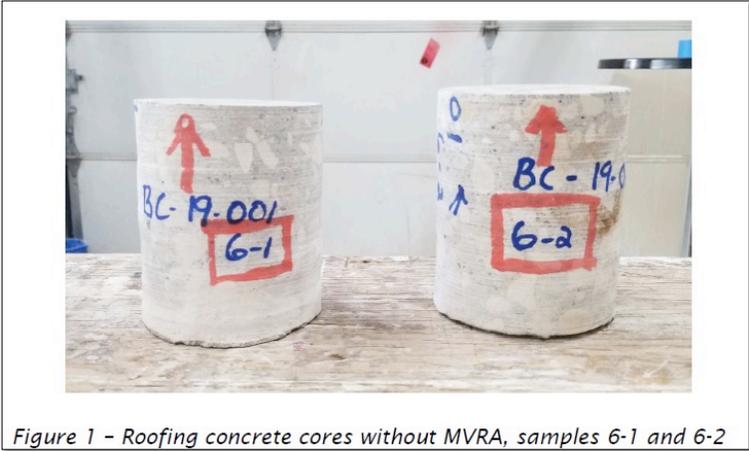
Roofing concrete cores without MVRA, samples 6-1 and 6-2
